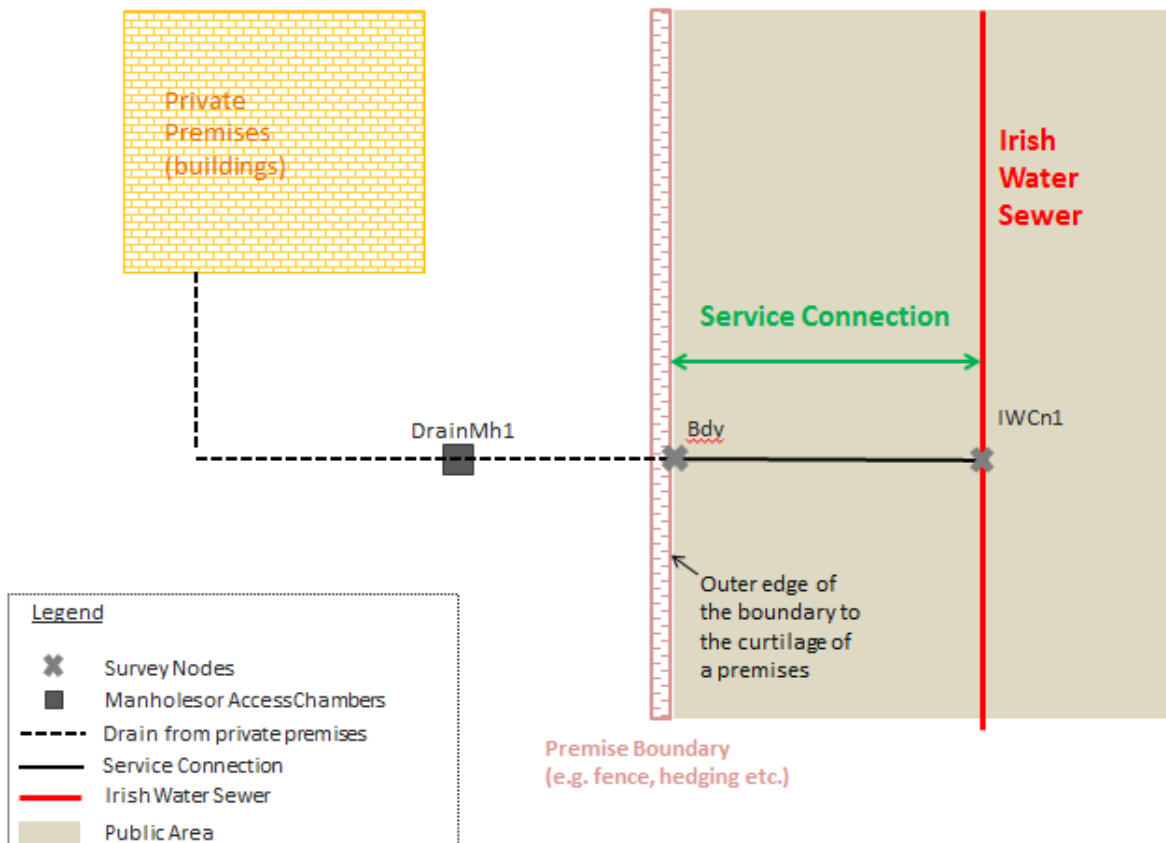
Typical arrangement of Drain, Service Connection and Irish Water Sewer
